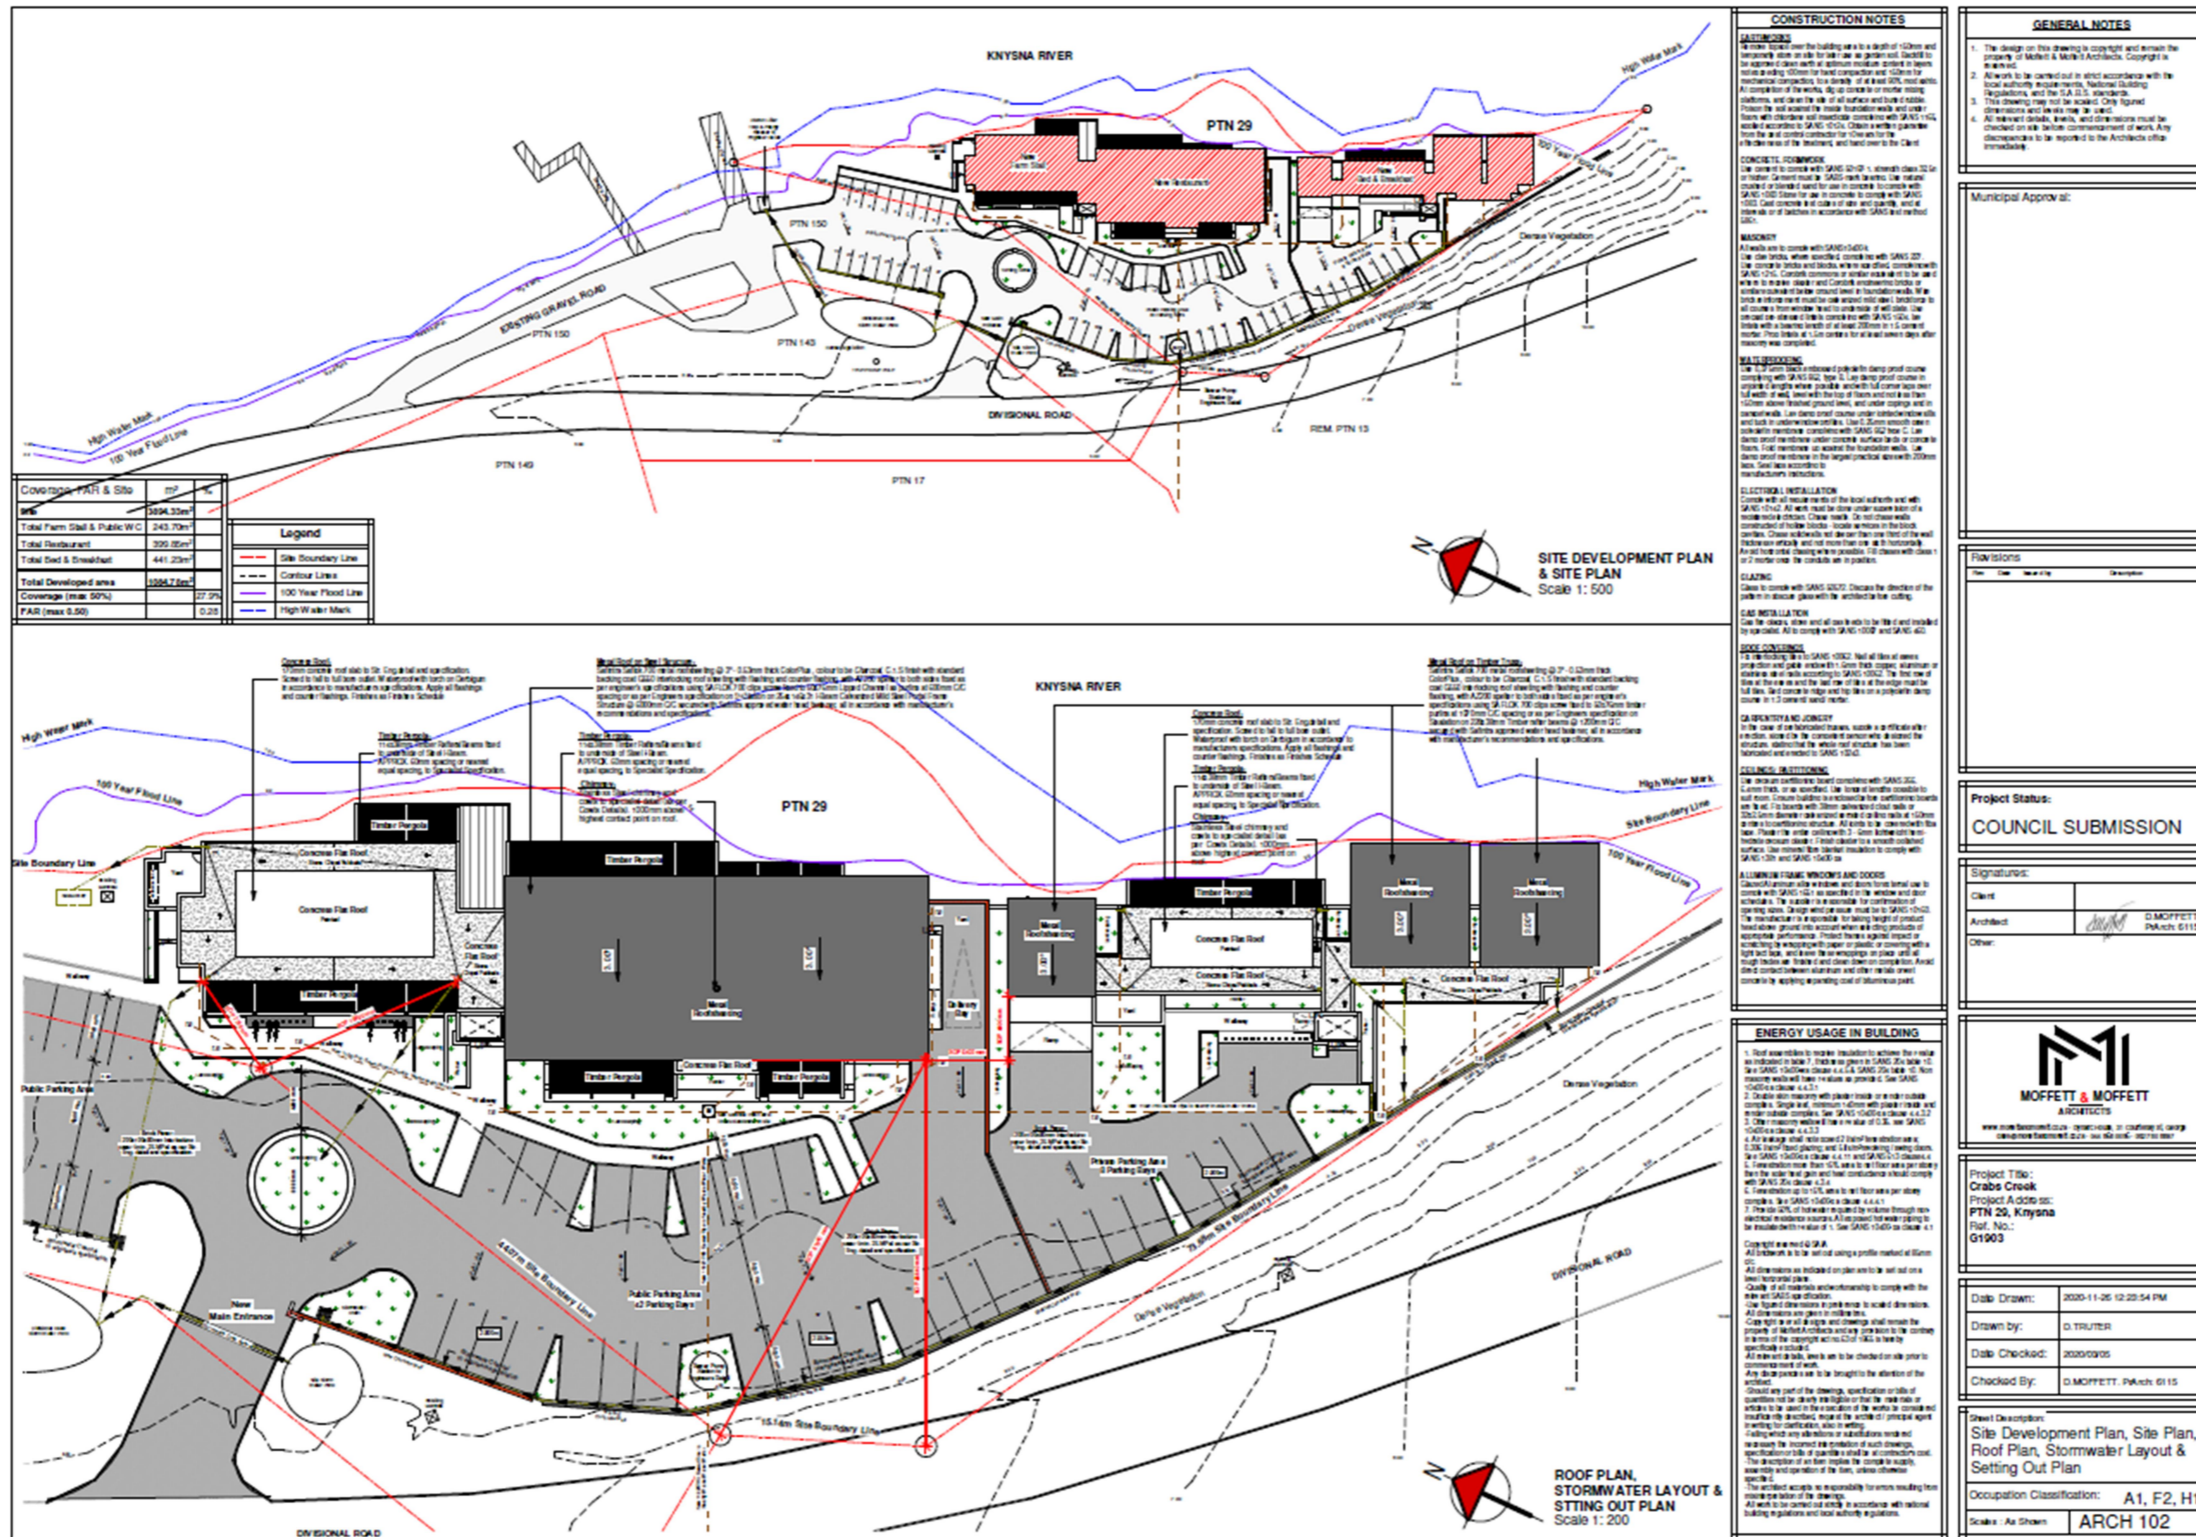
PROPOSED SITE DEVELOPMENT PLAN
